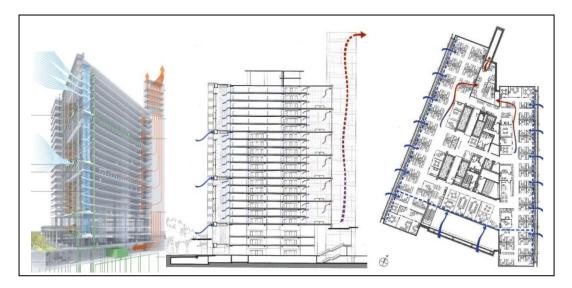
22: Manitoba Hydro tower, section and plan (solar chimney + atrium) (Salib & Wood, 2013)
